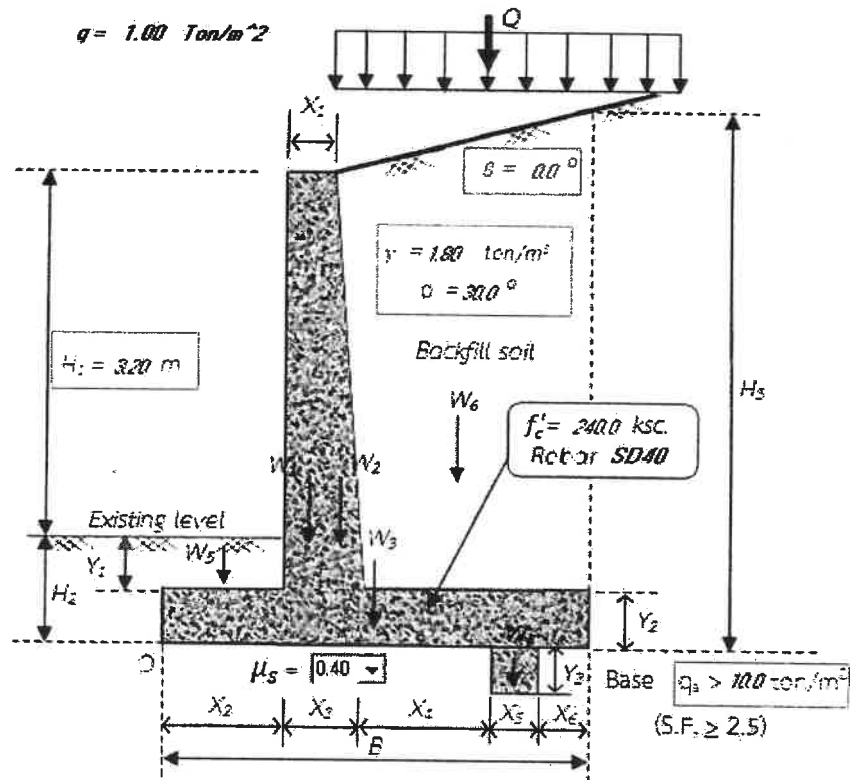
Model of RC cantilever Retaining wall (RCCRW) structure
